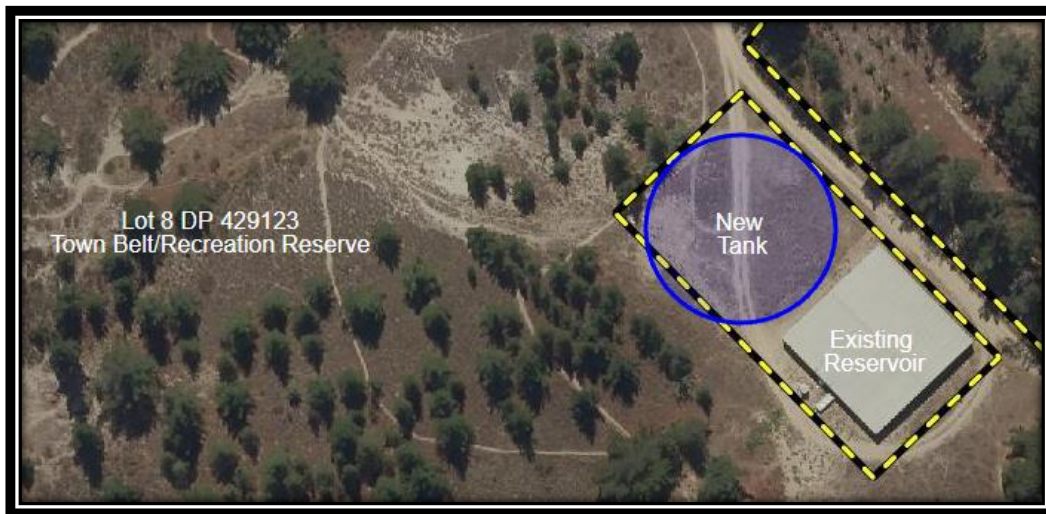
Outline plan of the new tank next to the existing reservoir on Lot 1 DP 27045 (not to scale).
